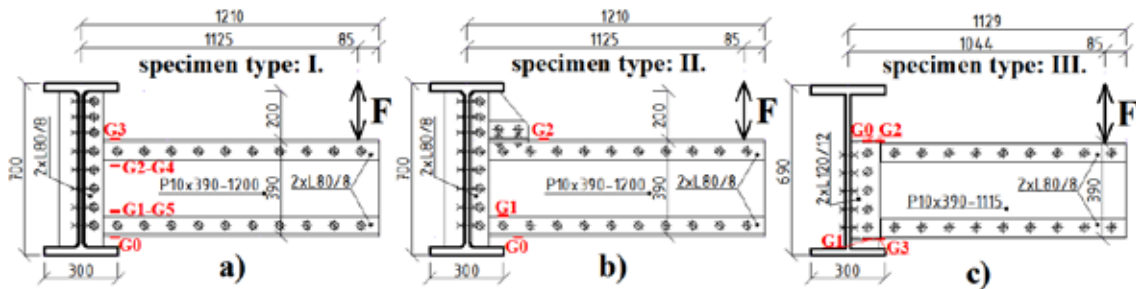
Configuration of laboratory specimens without haunch (I), reinforced by haunch (II), new specimens without haunch (III) and specimen gauge arrangement
